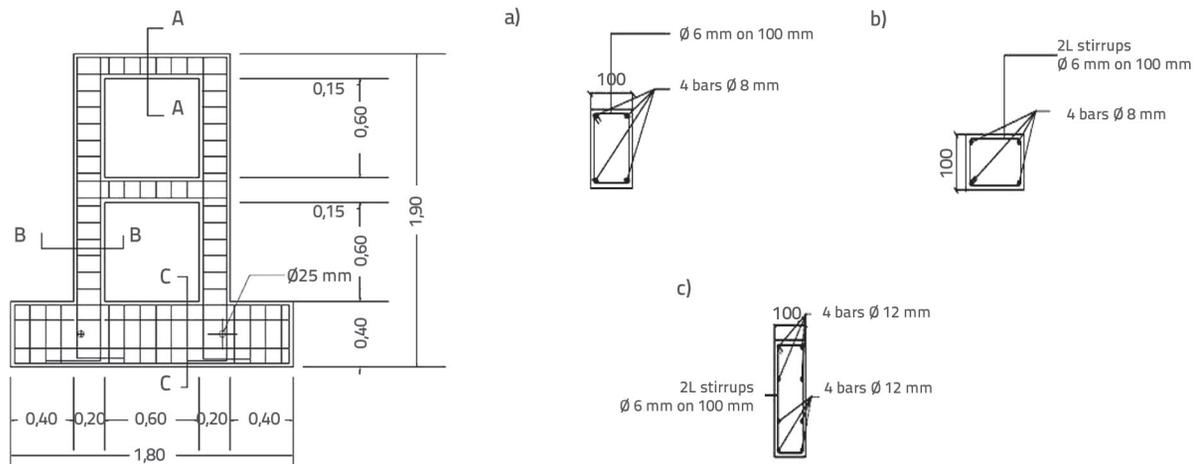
Frame reinforcement details: a) Section A-A; b) Section B-B; c) Section C-C
